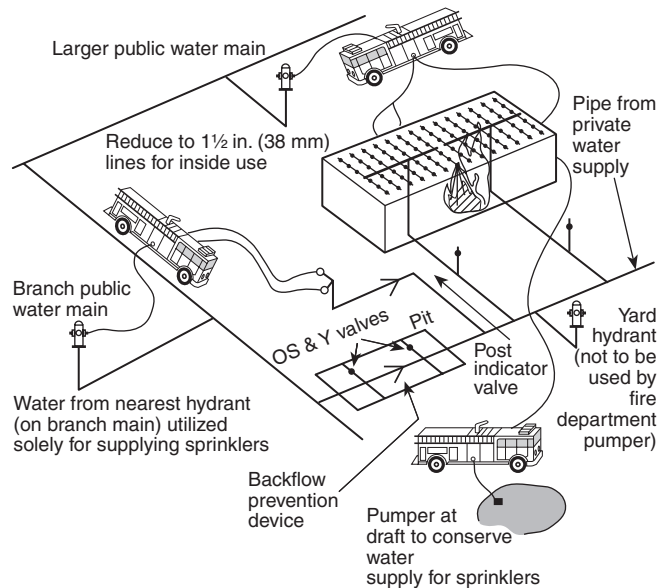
(c) Pumper Supply Options That Should Be Considered.
